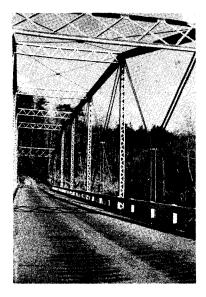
Pennsylvania Petit truss in Campbell County. This truss type was a variation of the Pratt truss with inclined chords in which each panel was subdivided. (Campbell County, photo #12520-8-18A.)
